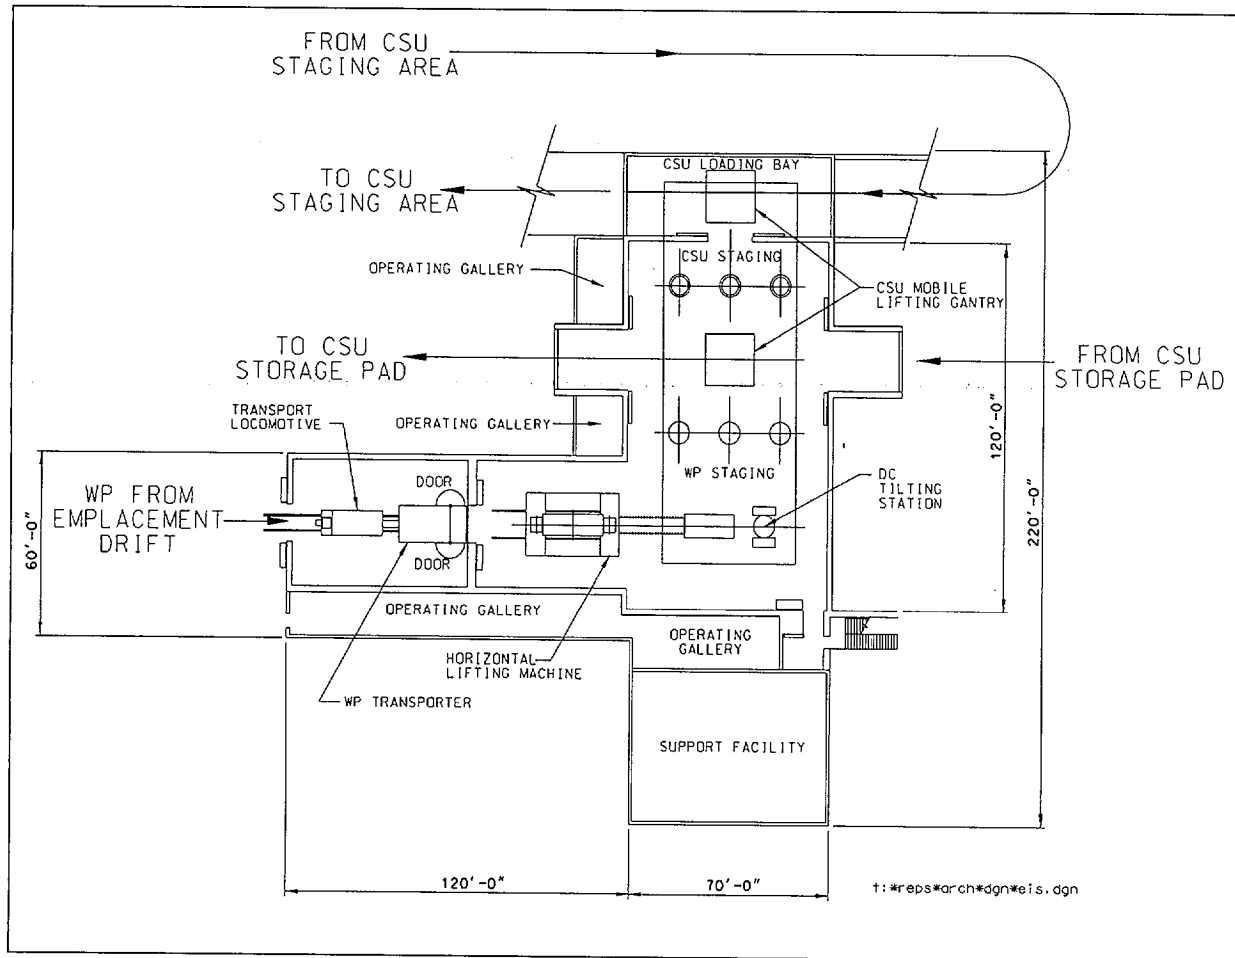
Waste Retrieval Transfer Building Conceptual Design
